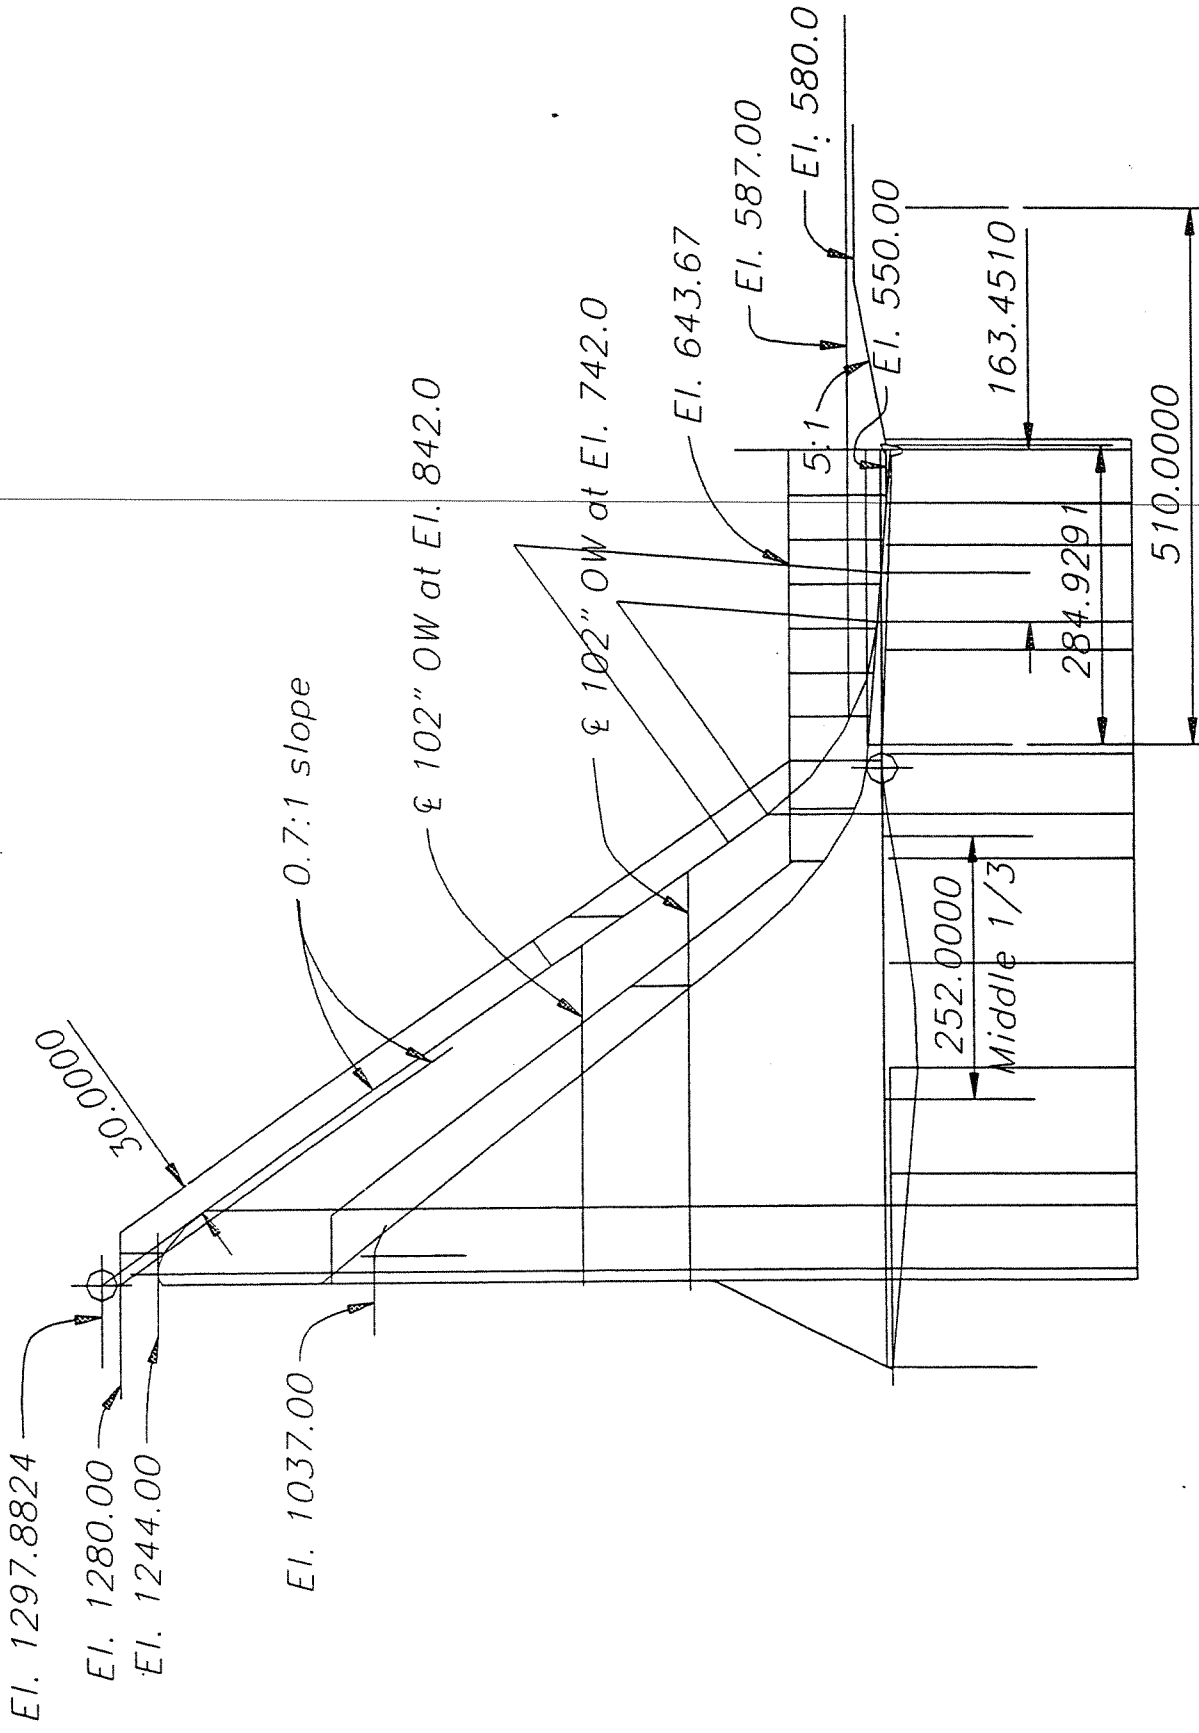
Shasta Dam, General layout of raised section over existing section.
